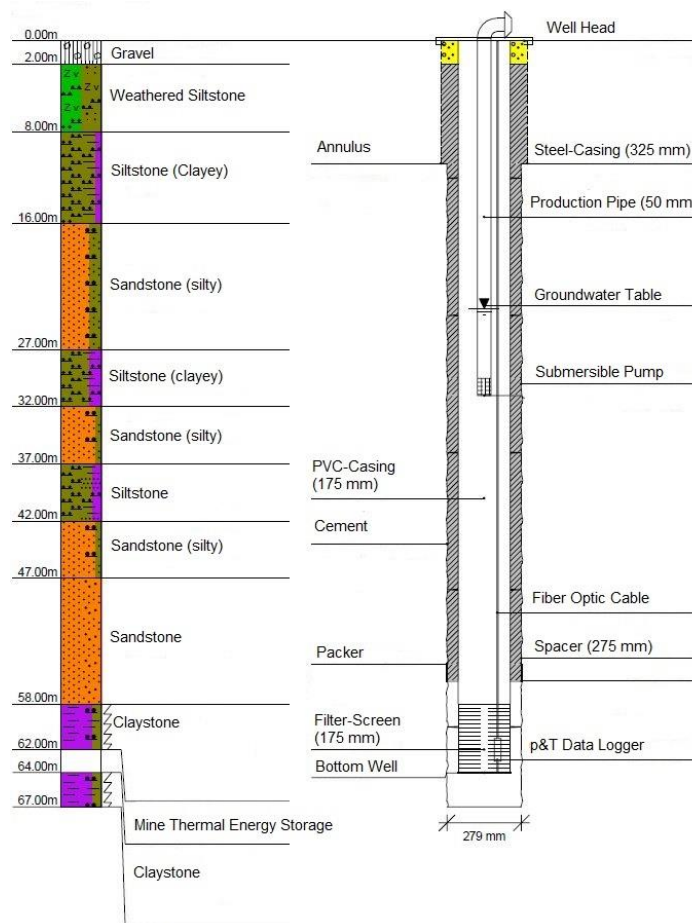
Design and construction of the MTES well MP1 at Fraunhofer IEG.
